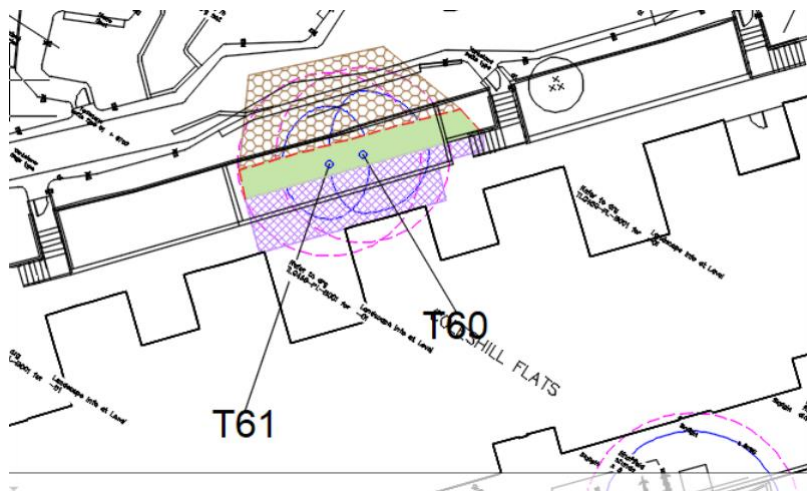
snip of the tree protection plan denoting specialist construction within the honeycomb hatch and no excavation within the magenta hatch.
